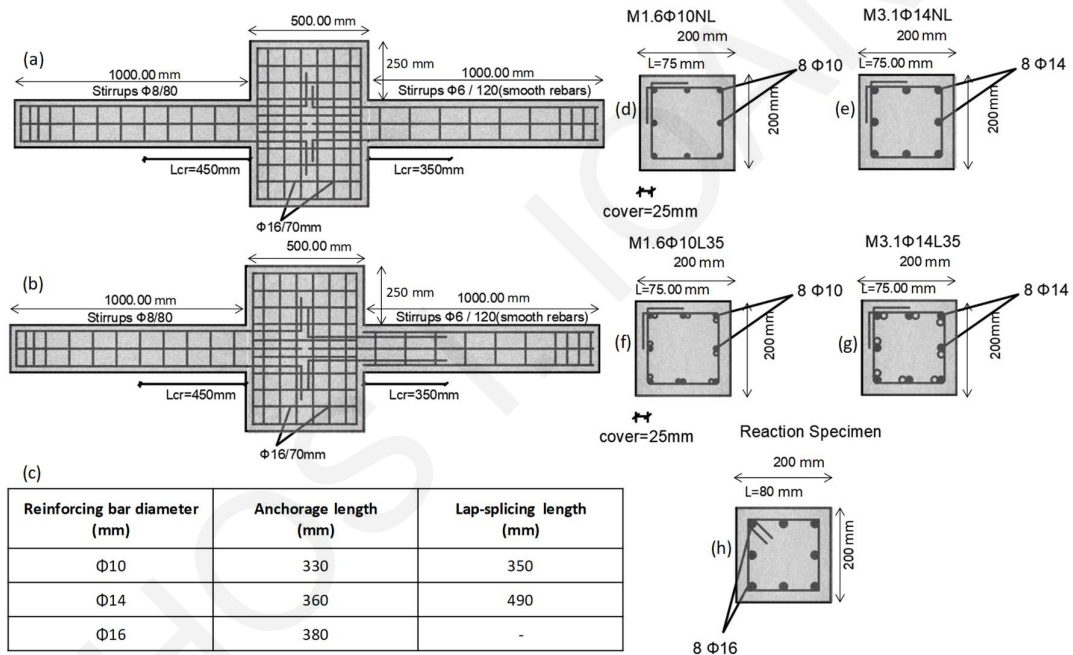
3: (a) M1.6Φ10NL steel reinforcement; (b) M1.6Φ10L35 steel reinforcement; (c) Table of lap-splicing and anchorage lengths; (d) M1.6Φ10NL section; (e) M3.1Φ14NL section; (f) M1.6Φ10L35 section; (g) M3.1Φ14L35 section; (h) Reaction element section.
